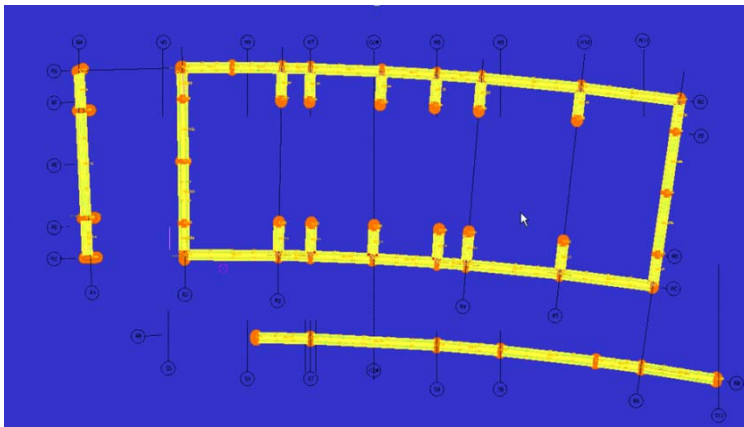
Plan view of girders at level -3.50 showing curved grids.
